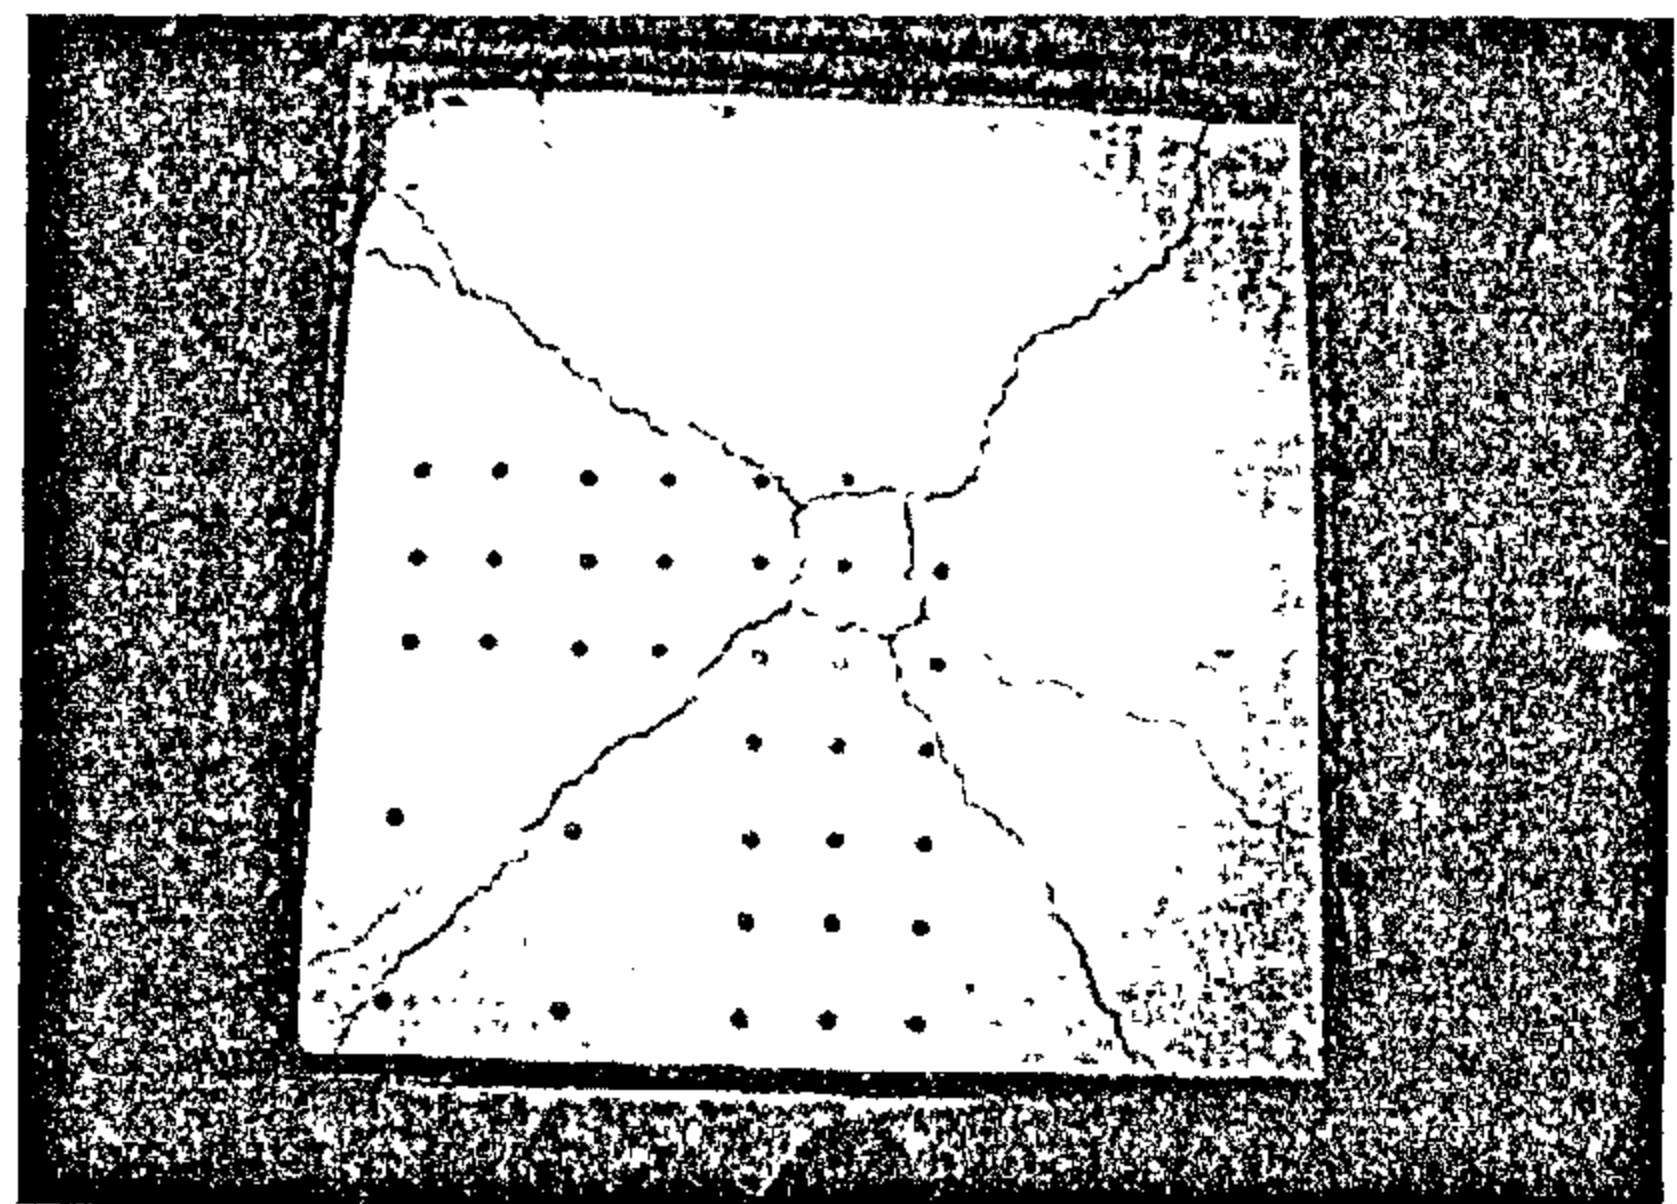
Final crack pattern for steel fiber reinforced concrete specimen
